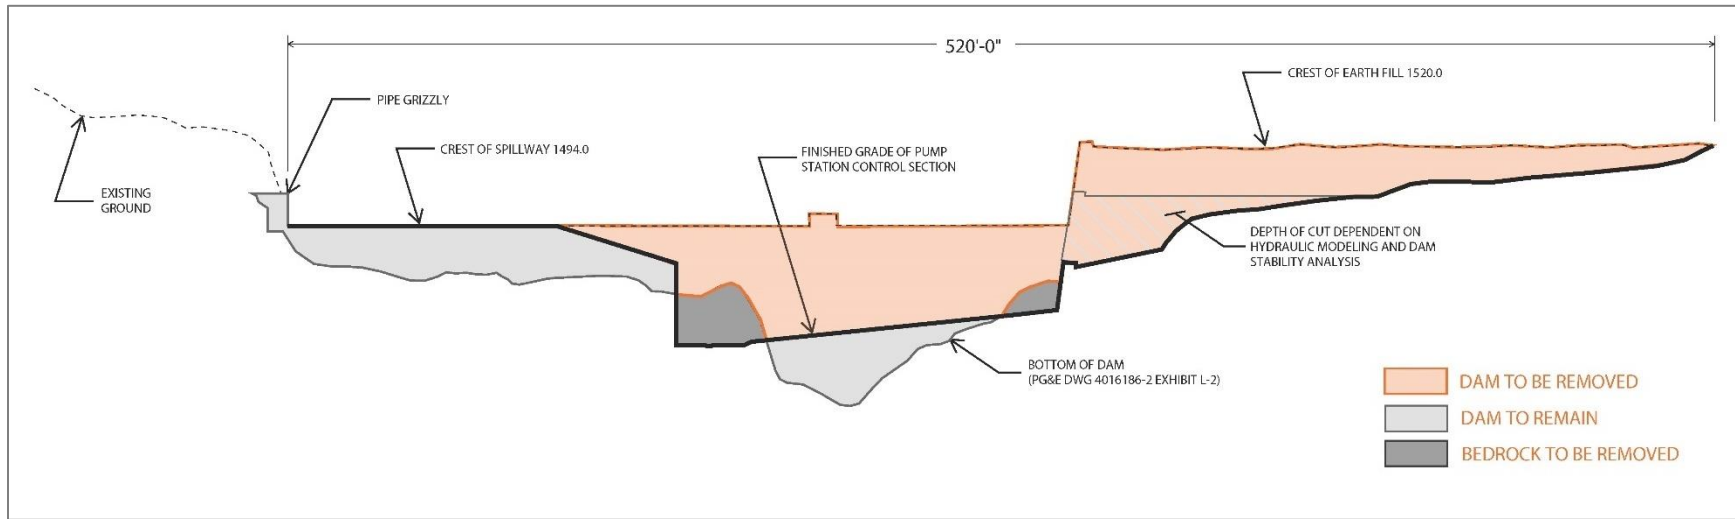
Cape Horn Dam Control Section with Pump Station - Final Dam Removal (Cross Section Through Dam)
